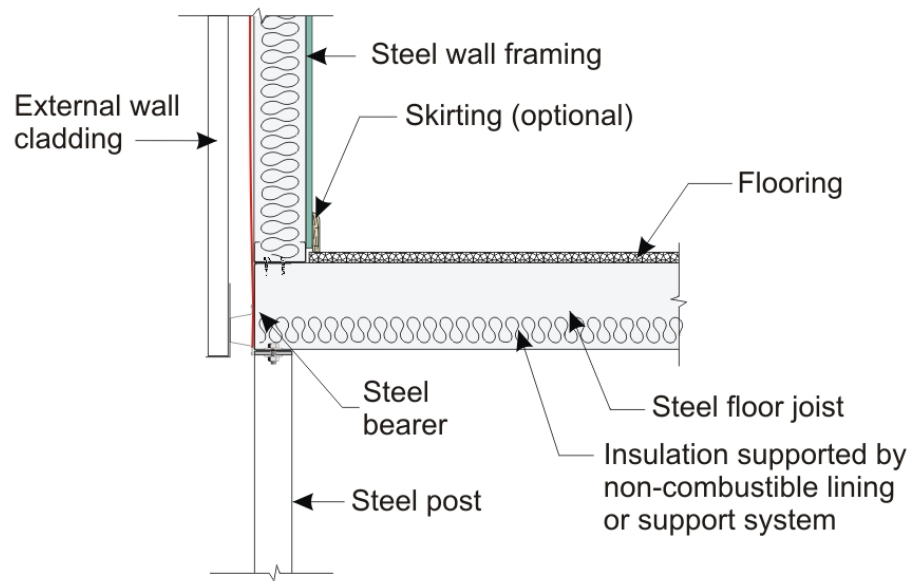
Typical floor and subfloor details BAL-12.5, BAL-19, BAL-29 and BAL-40
